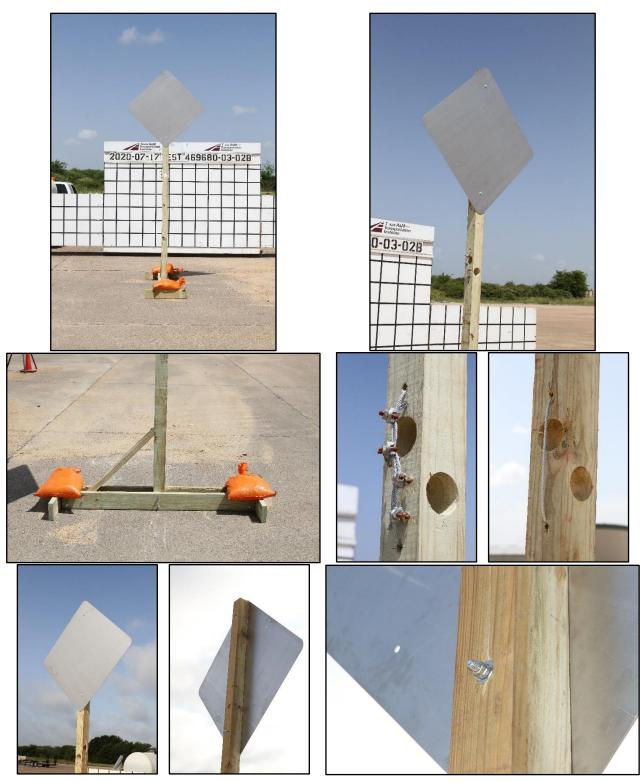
Modified TxDOT Single Skid-Mounted Sign Support (Final Modification) prior to Crash Test Nos. 469680-03-2B, 469680-03-4, 469680-03-1, and 469680-03-3 (Typical).
